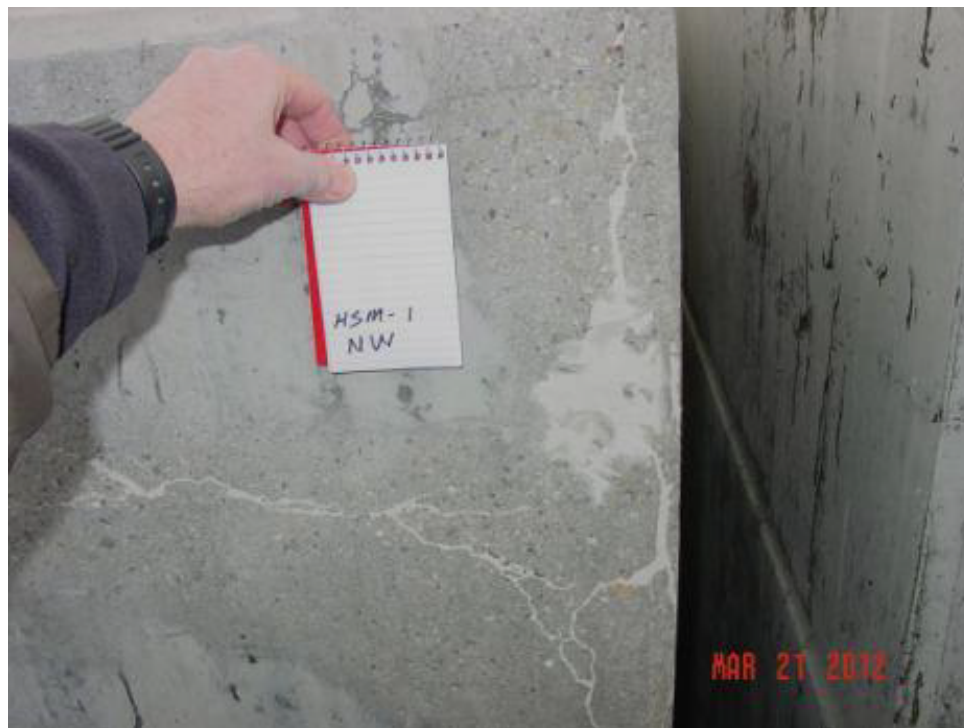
HSM 01 NW CORNER ROOF POST REPAIR
